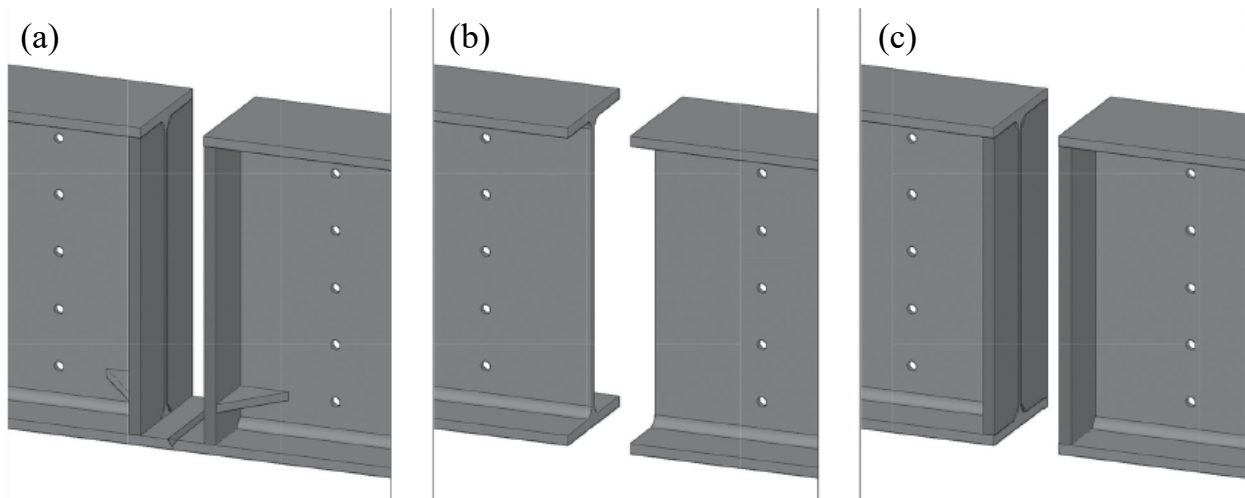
Connection Details of the Three Specimens: (a) Specimen 1, (b) Specimen 2, and (c) Specimen 3 [9].
